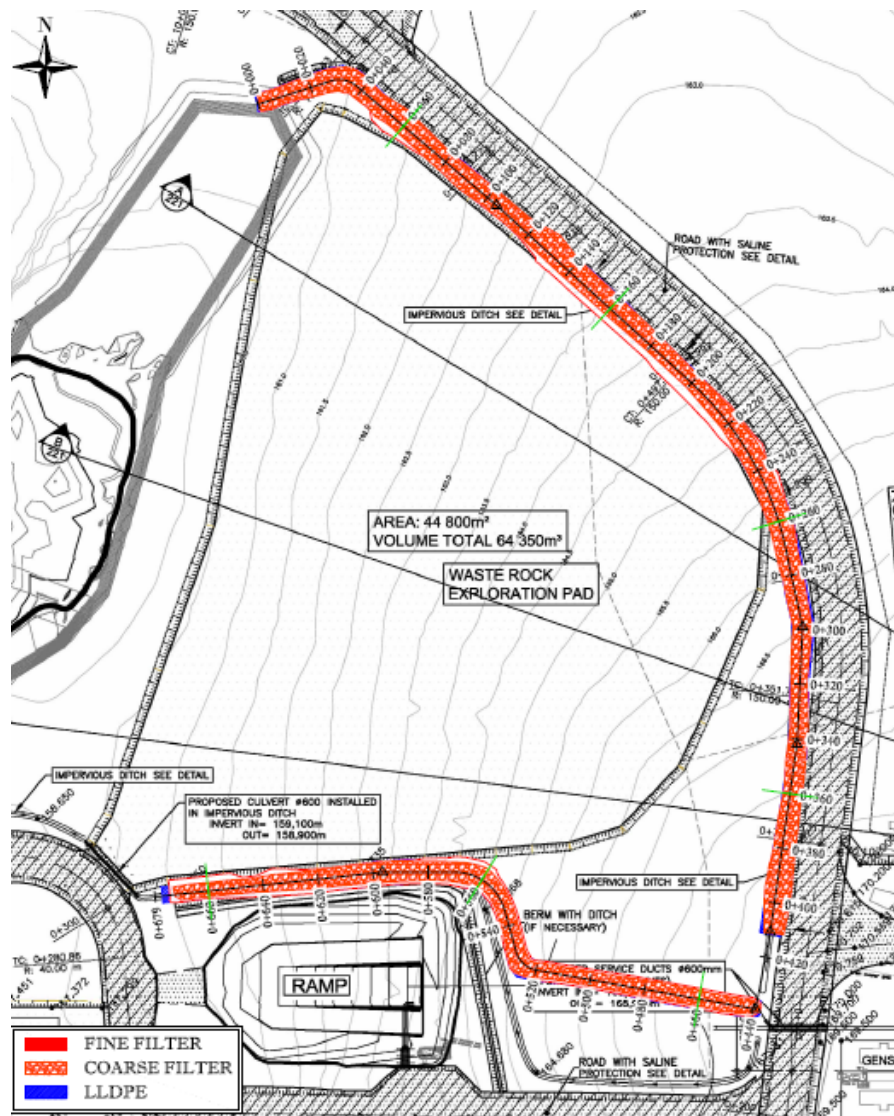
Plan View of Underground WRSF Saline Ditch
